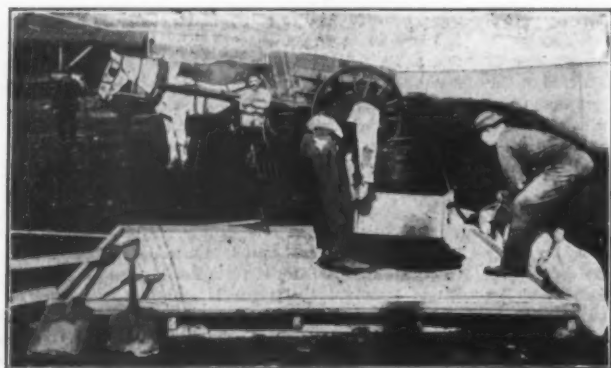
LIFTING OFF THE SAND-MEASURING BOX AND GETTING CEMENT READY
